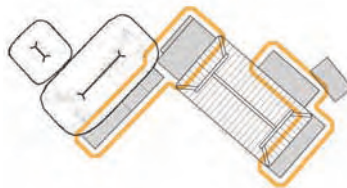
Examples of changes in structure (Shapes of roofs)
